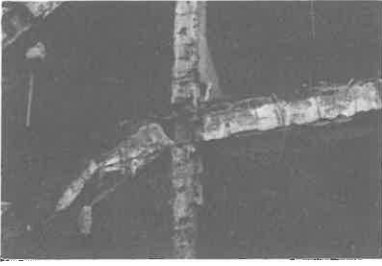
IV) In old steel construction bolted connections are a weak point. In new steel construction weld failure in steel box columns resulting in buckling of steel plates.
